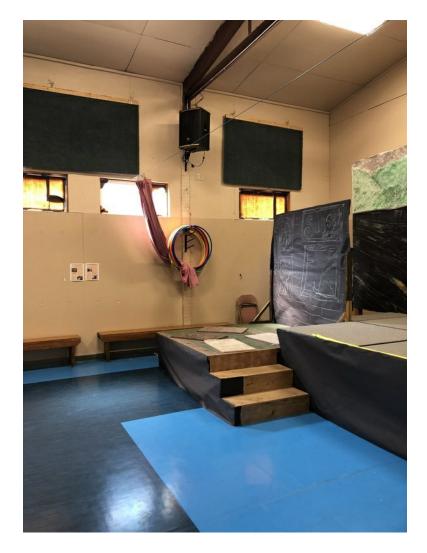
Window Openings in South Exterior Wall (looking South)
